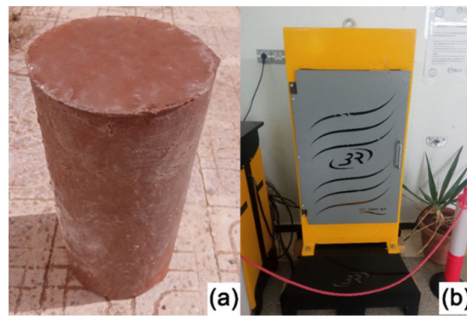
Compression test of cylindrical specimens (a), using a test machine (b).
